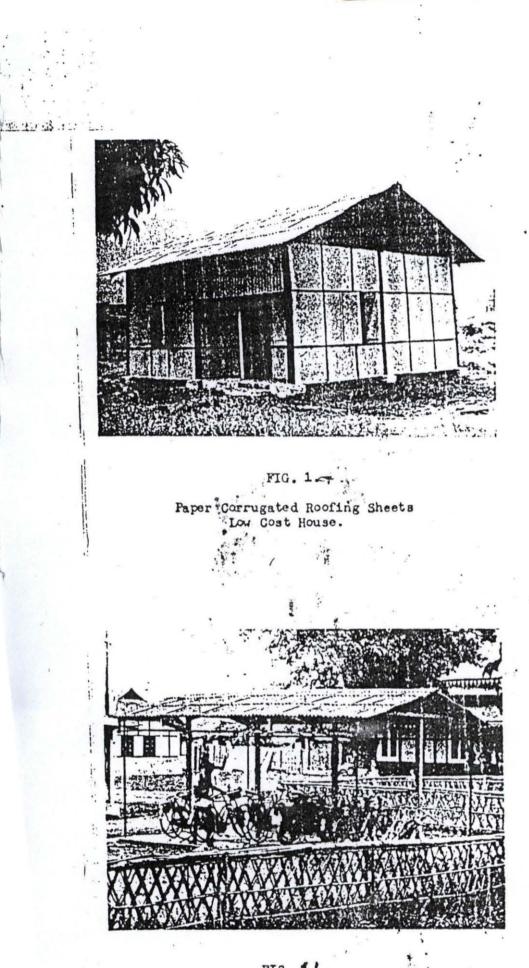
Paper Corrugated Roofing Sheets Cycle Stand
